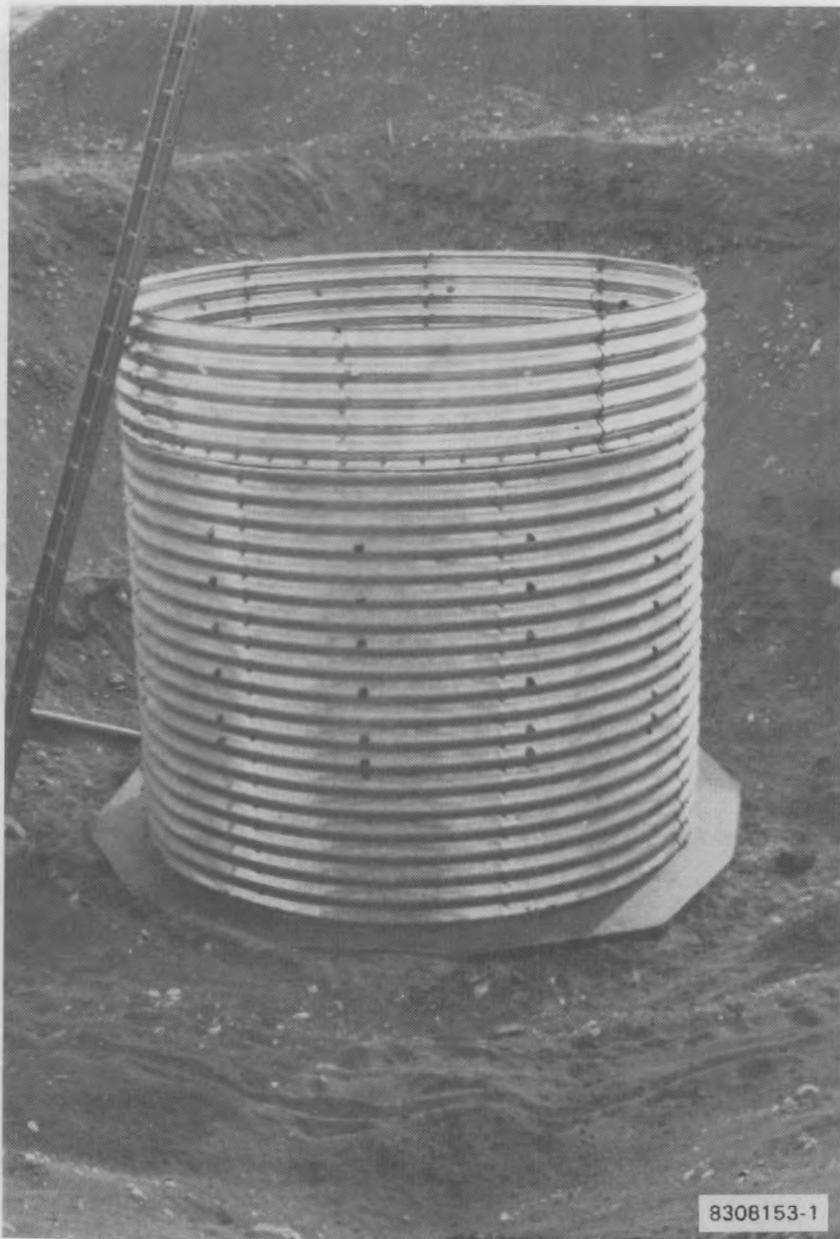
Central Instrument Caisson on Concrete Pad in Center of Excavation
